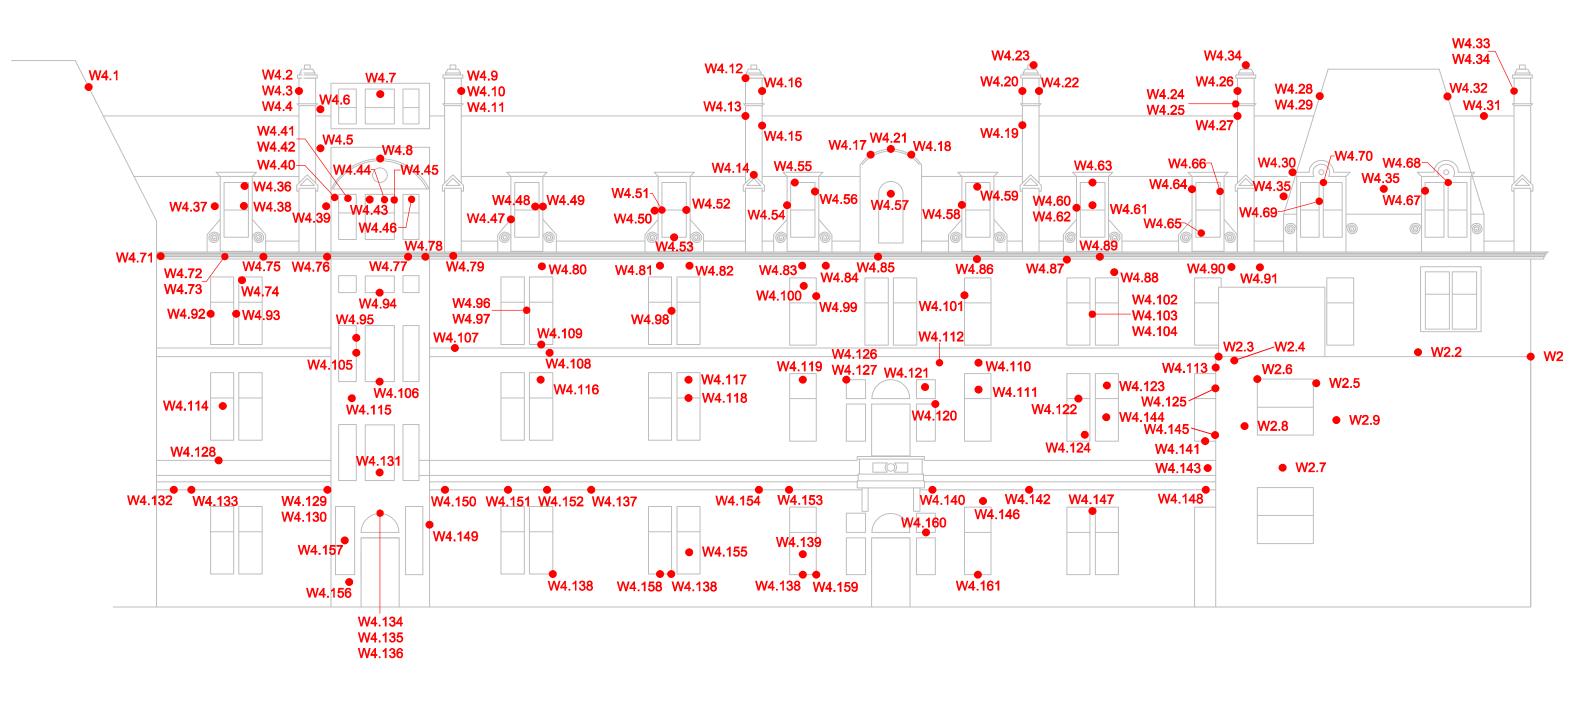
Elevation W2 and W4 of Station Hotel Building showing Defect/Observation Locations
